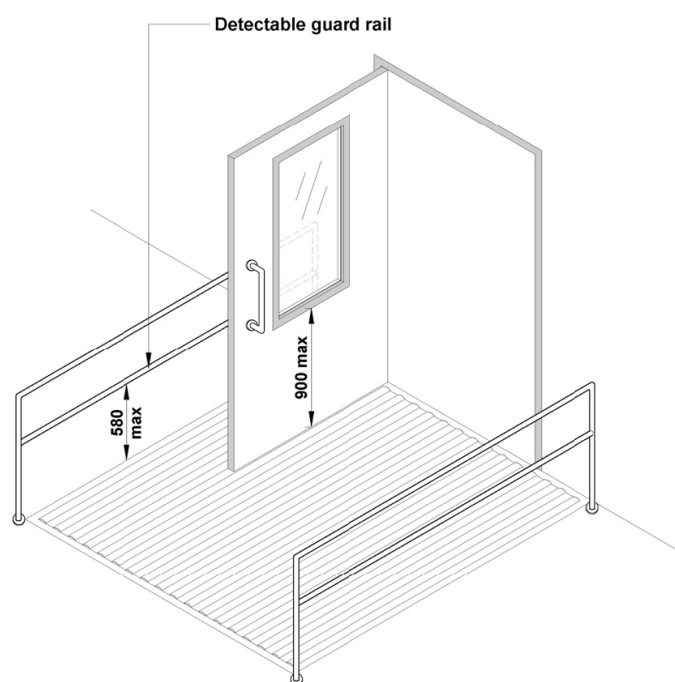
Guardrail for internal doors that opens outwards into the horizontal circulation
